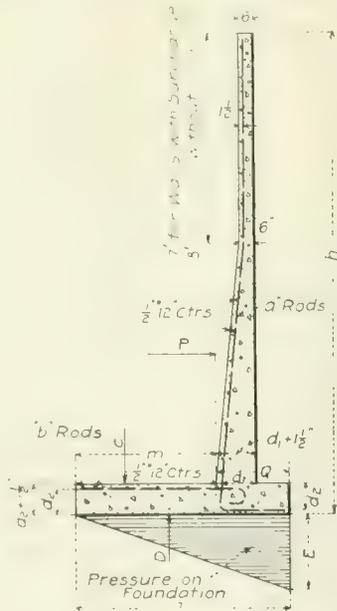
Section of Typical Retaining Wall Showing Reinforcement and Properties to Which Reference is Made.
